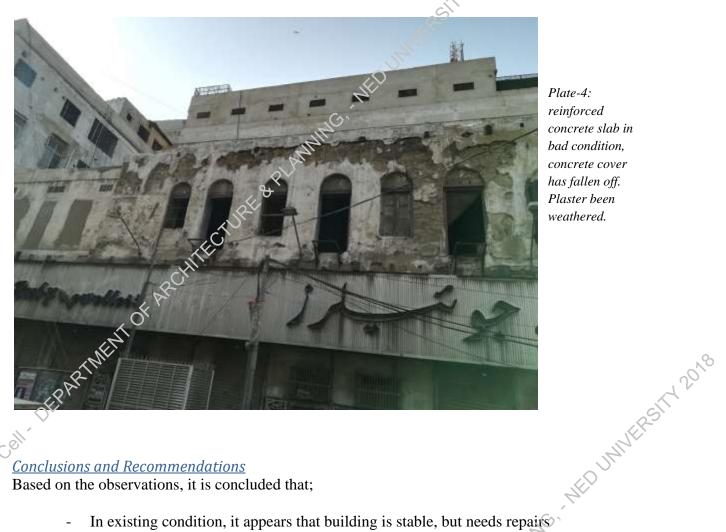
reinforced concrete slab in bad condition, concrete cover has fallen off. Plaster been weathered.
